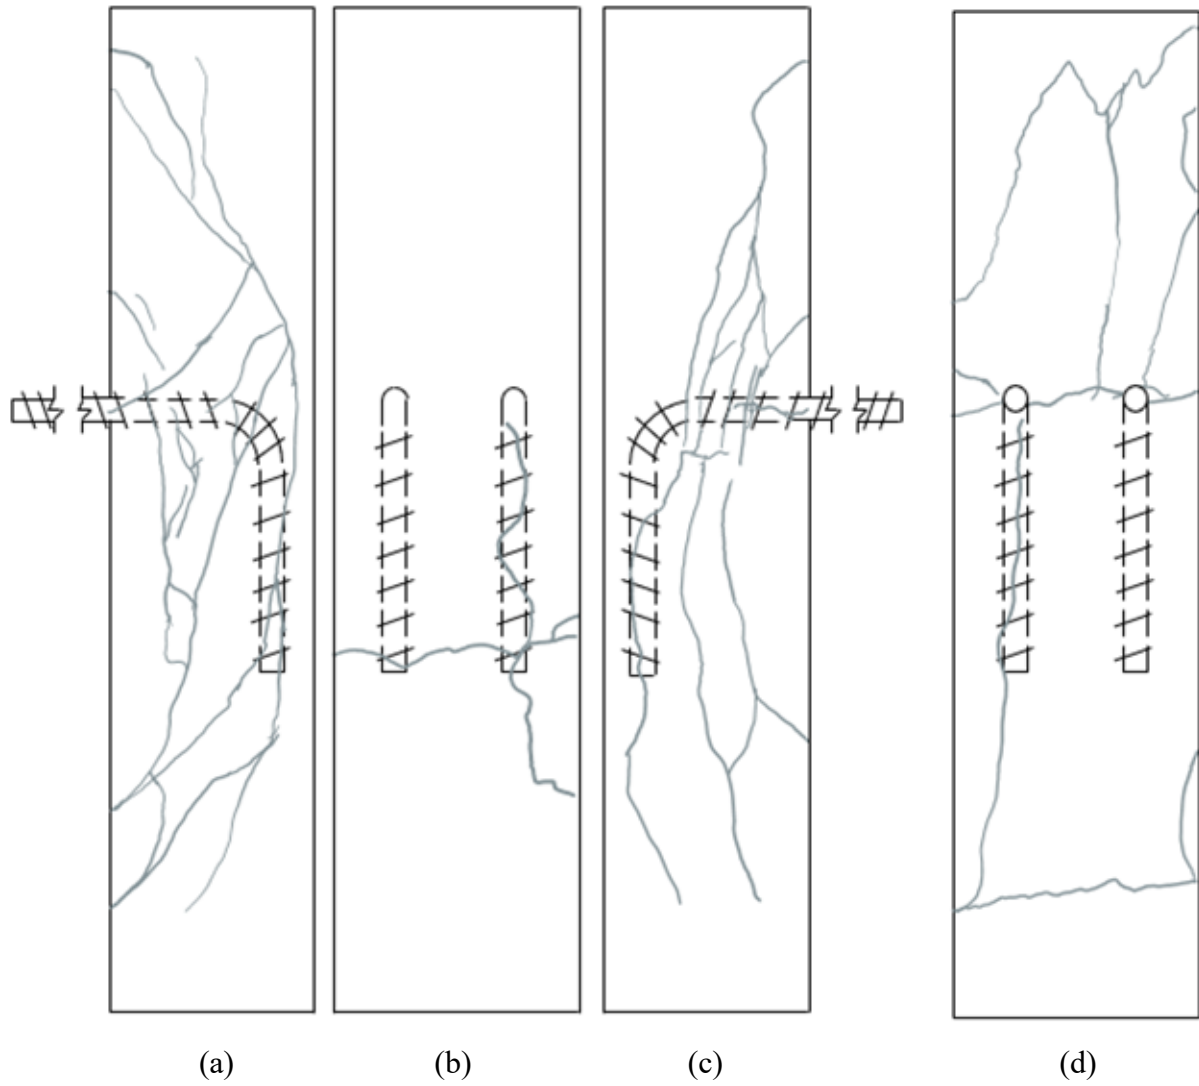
Crack pattern at maximum normalized tensile load for beam-column joint specimen MD4-90: (a) west side face, (b) back face, (c) east side face, and (d) front face
